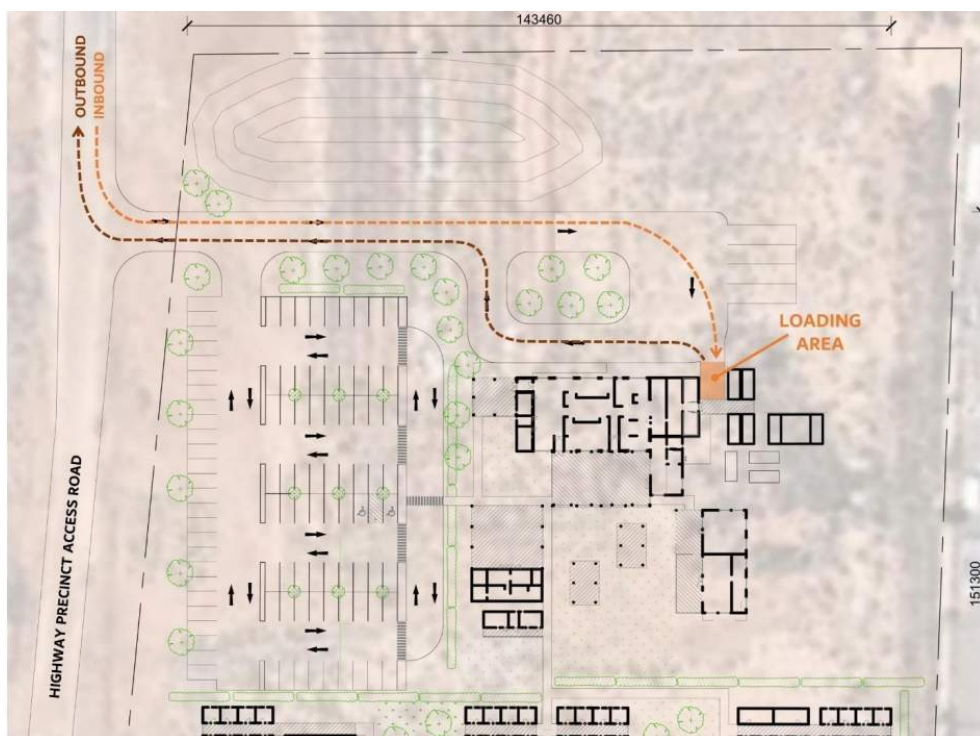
Proposed delivery and service vehicle movement into and out from the site (base plan source: Grounded, 2022)
